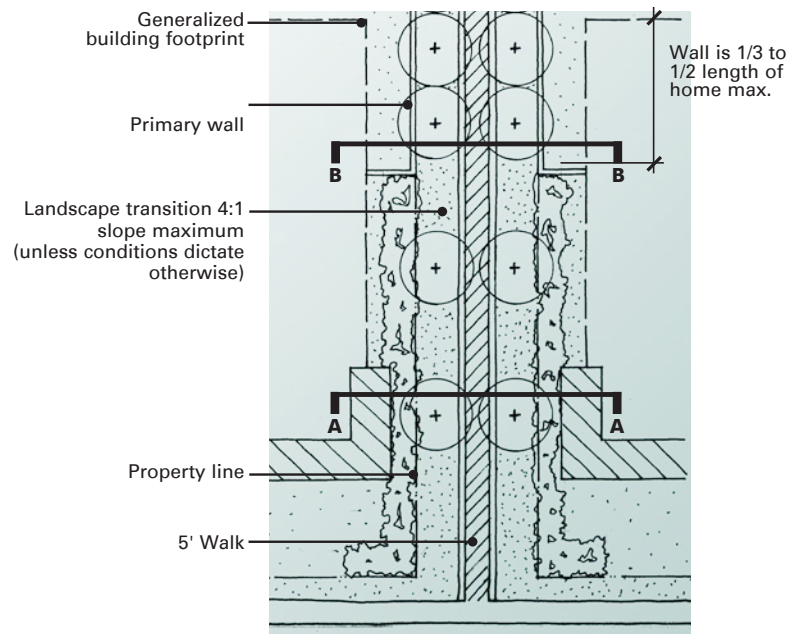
MID-BLOCK PASS-THROUGH PLAN
